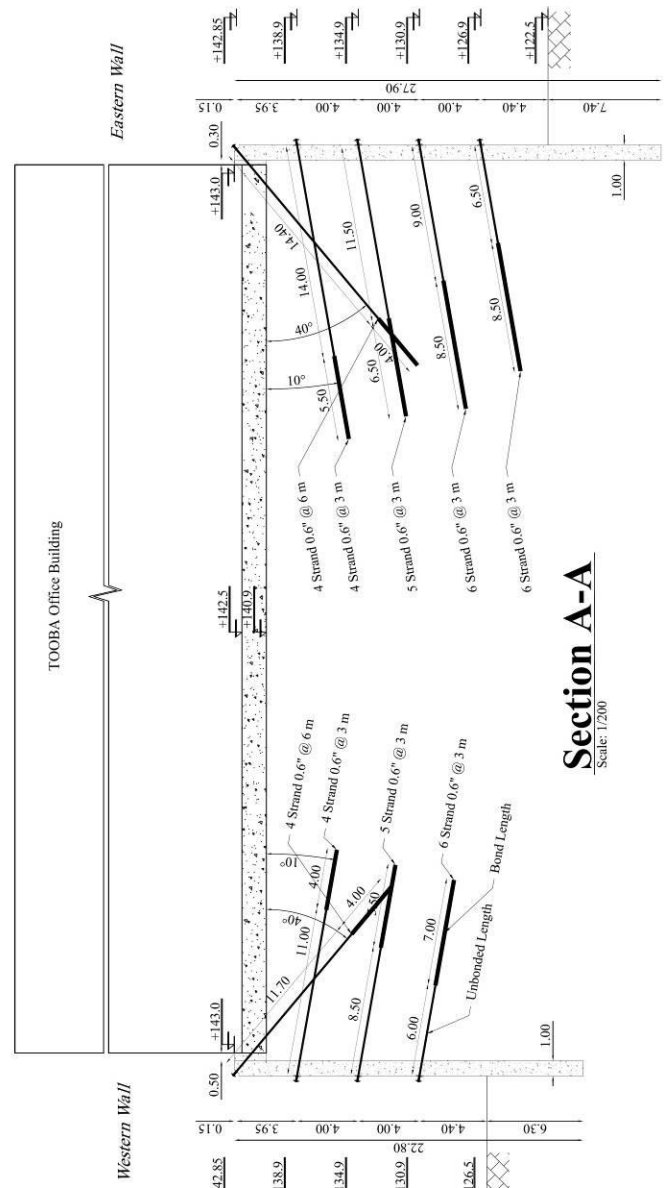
Section A-A depicting details of the retaining structure on the east and west of the tower
